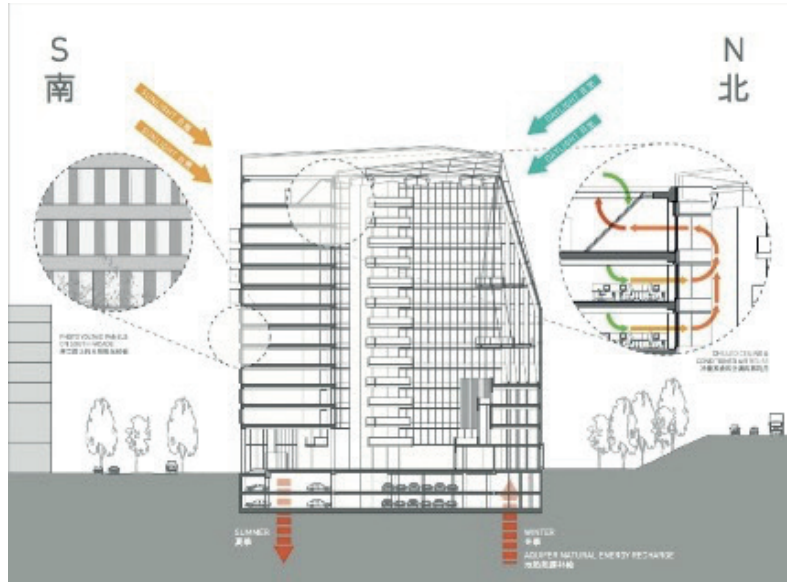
Section showing the atrium and south-facing façade providing thermal mass and shading [15].
